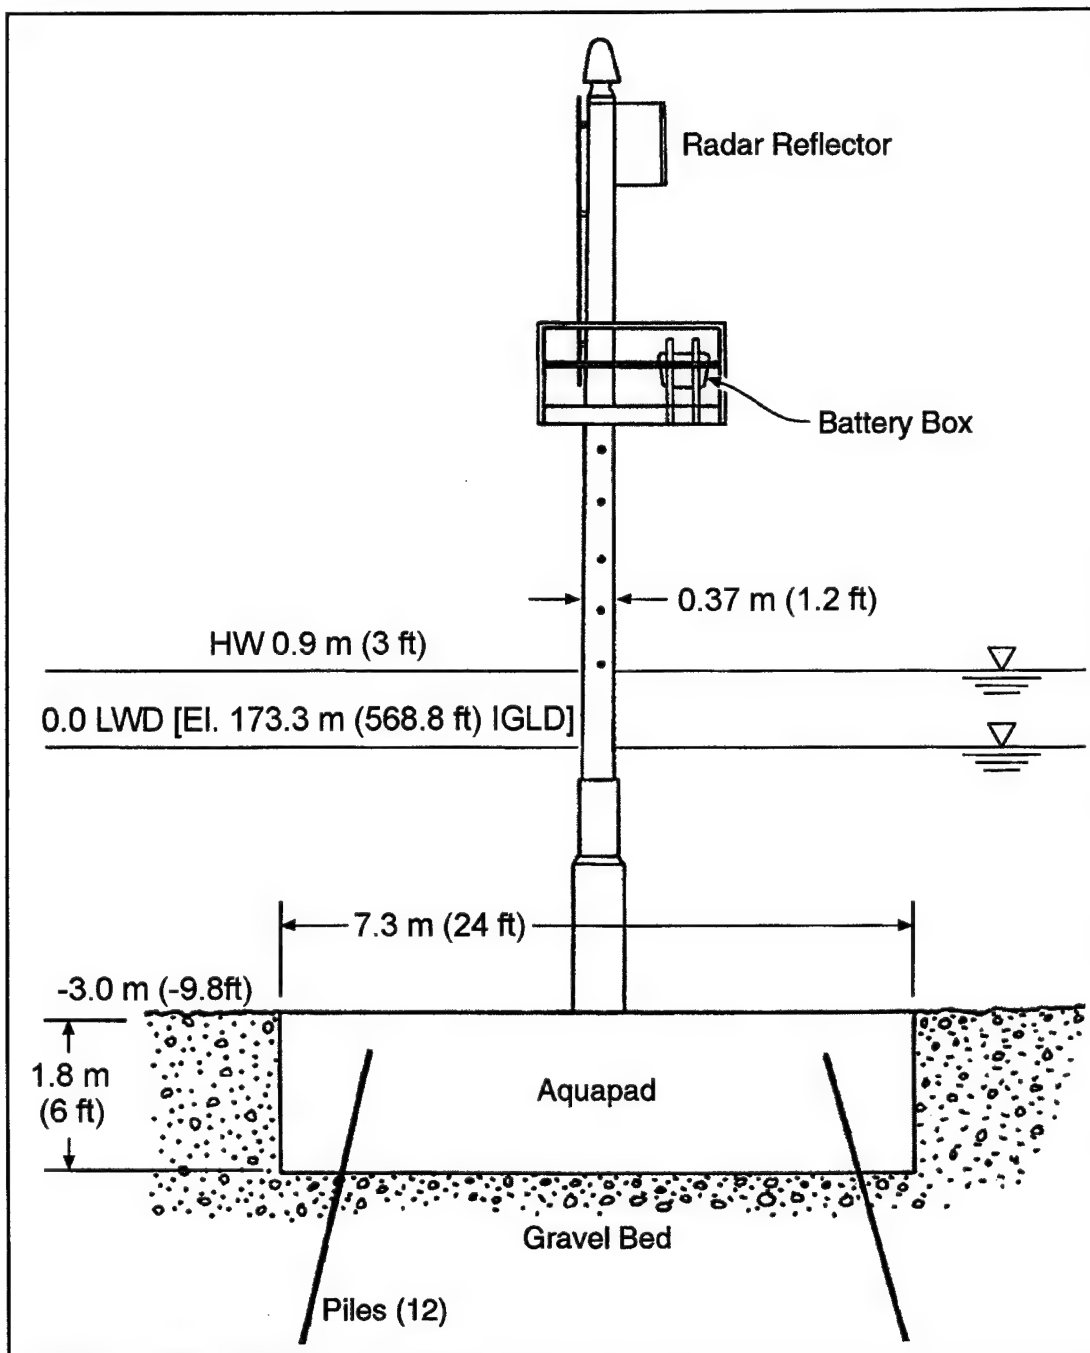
Steel light tower on Maumee Bay, Lake Erie. The tower has a square cross section
